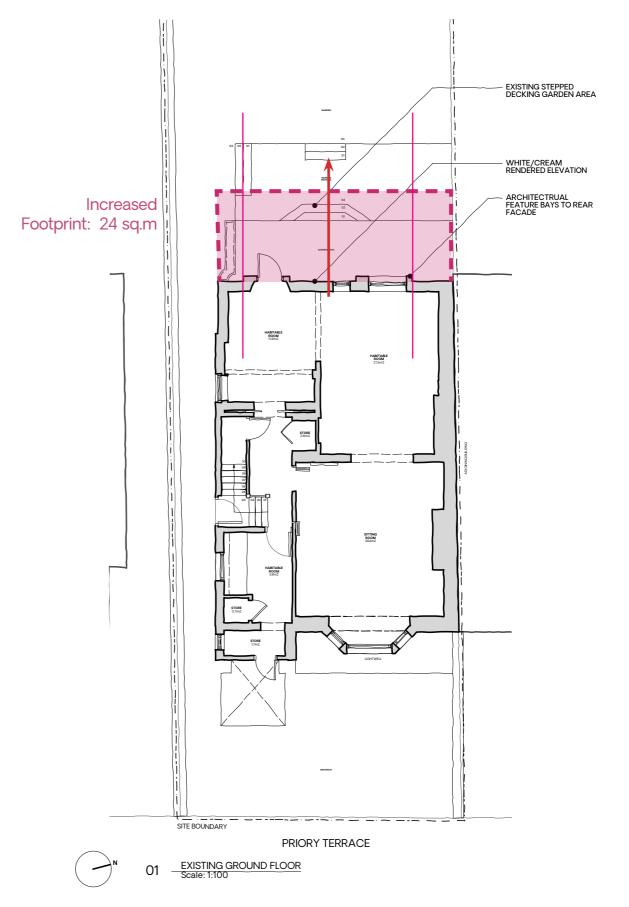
Ground floor existing layout with overlaid proposed footprint overlay
